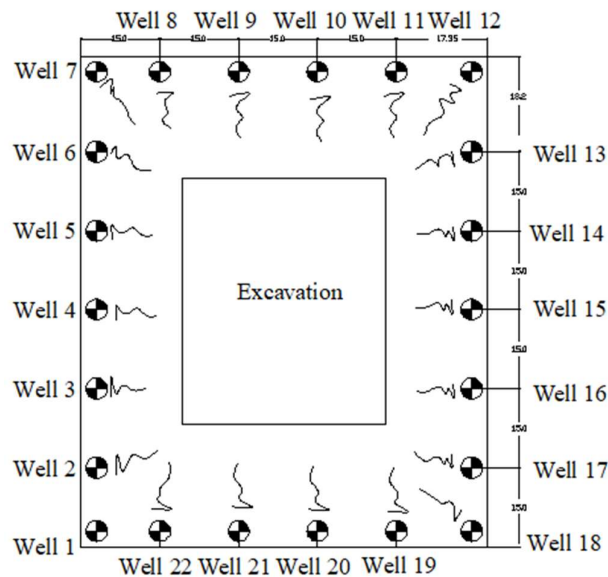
Schematic plan of twenty-two wells system (with $x_c=39$, $y_c=47$).
